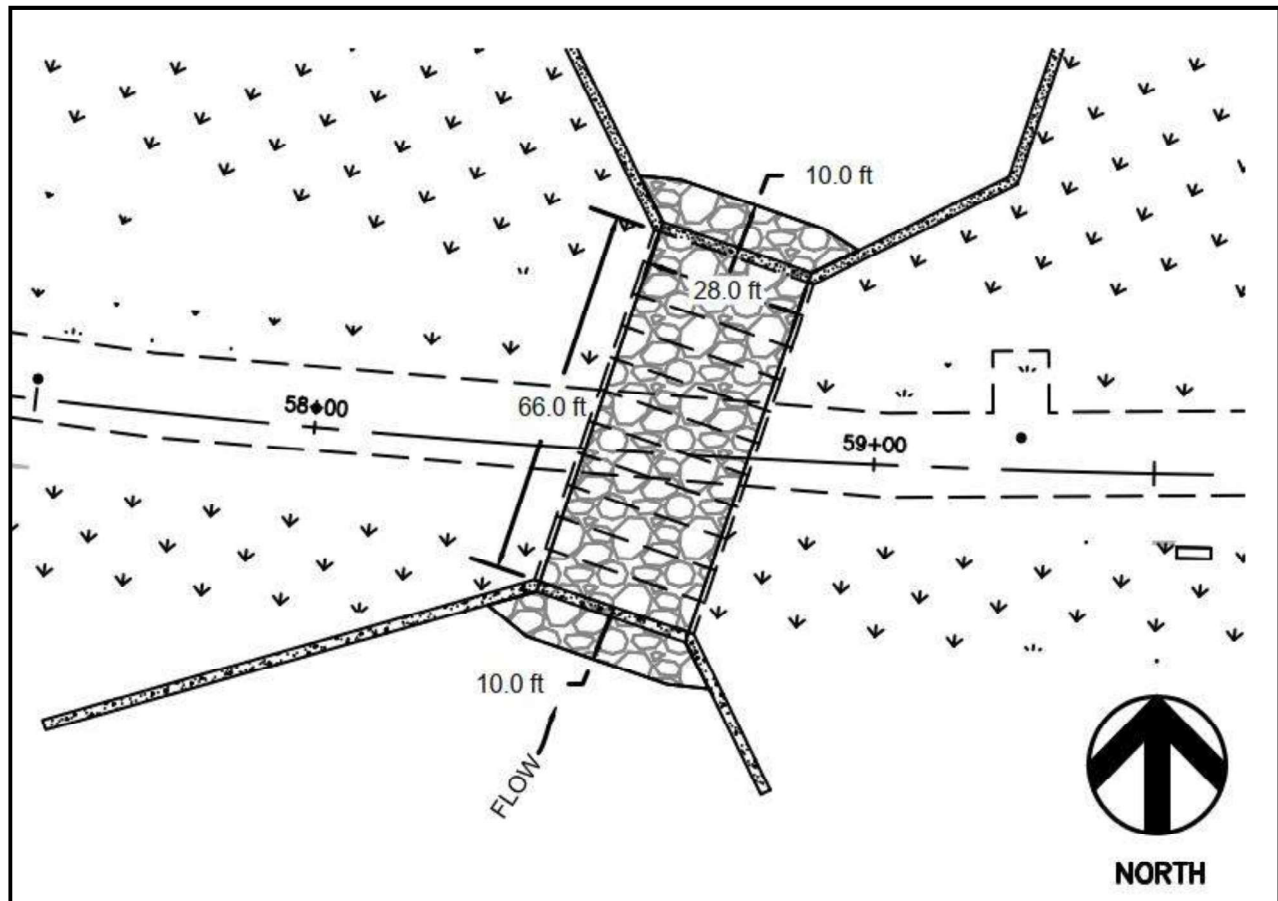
Plan View: Riprap Protection for CON/SPAN Culvert with Wingwall
